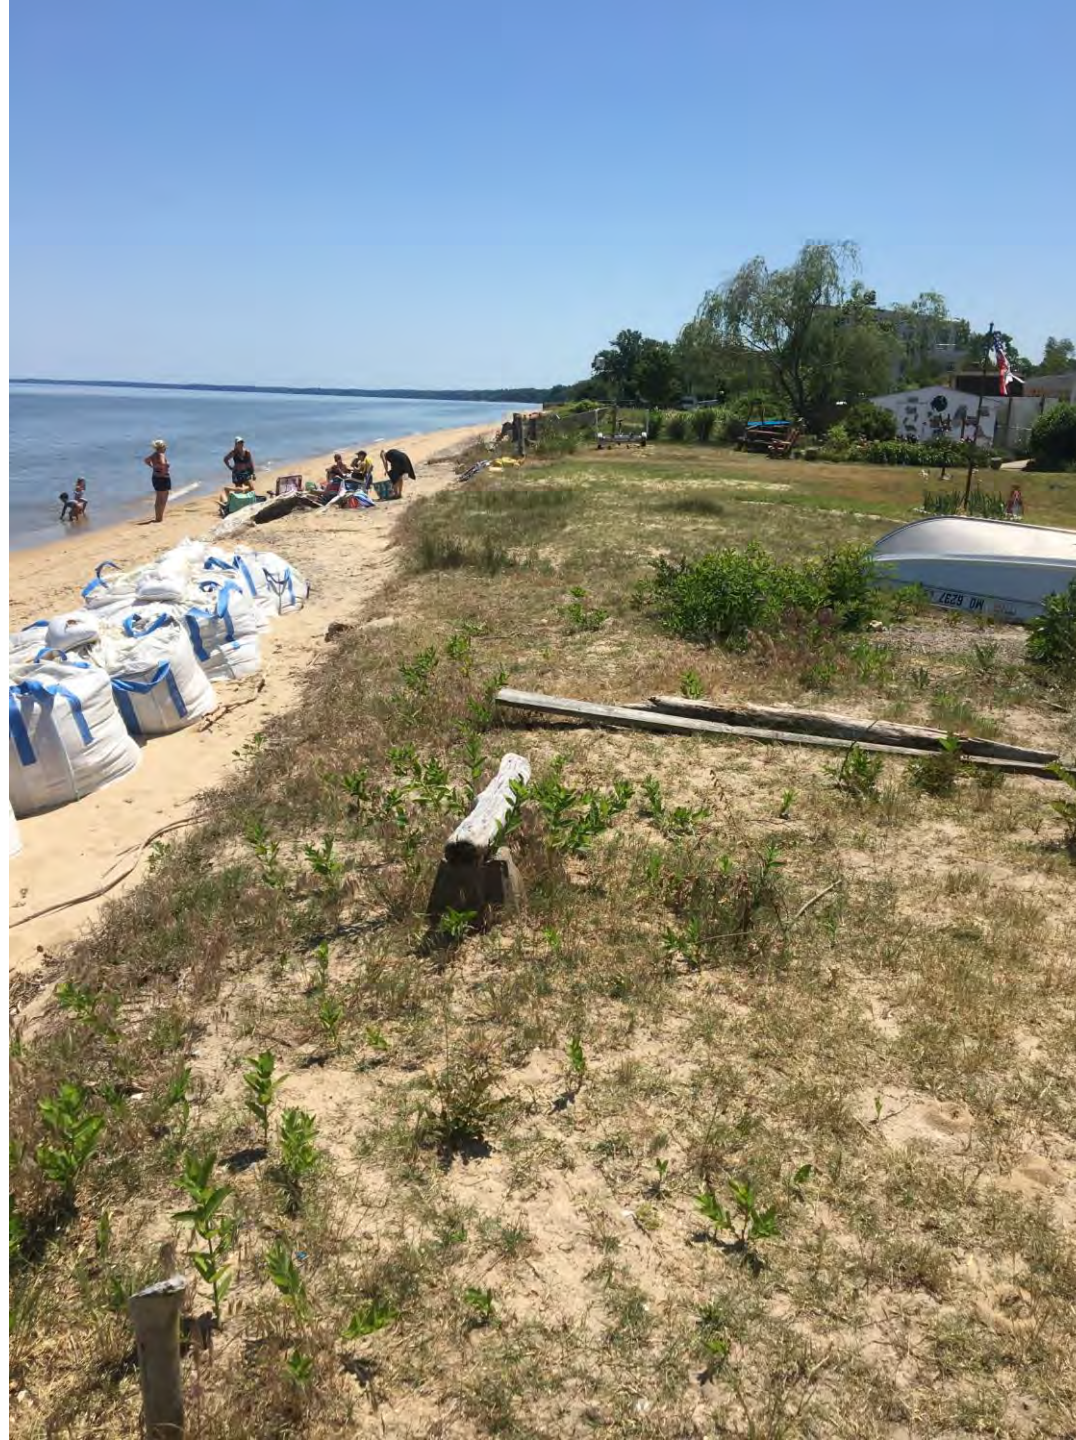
Looking south from the meeting house shore. Beach meeting took place on May 21, 2021
